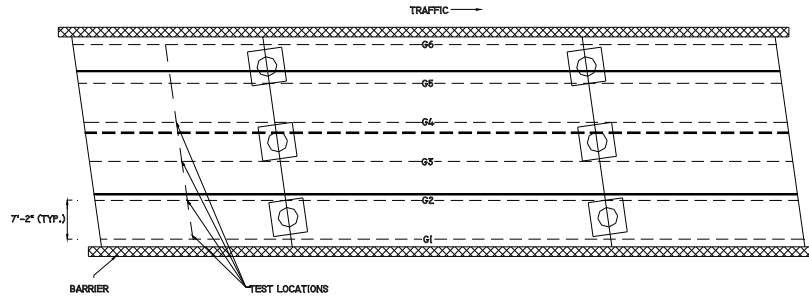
Plan view of bridge 1-791 (Courtesy of Holloway)
